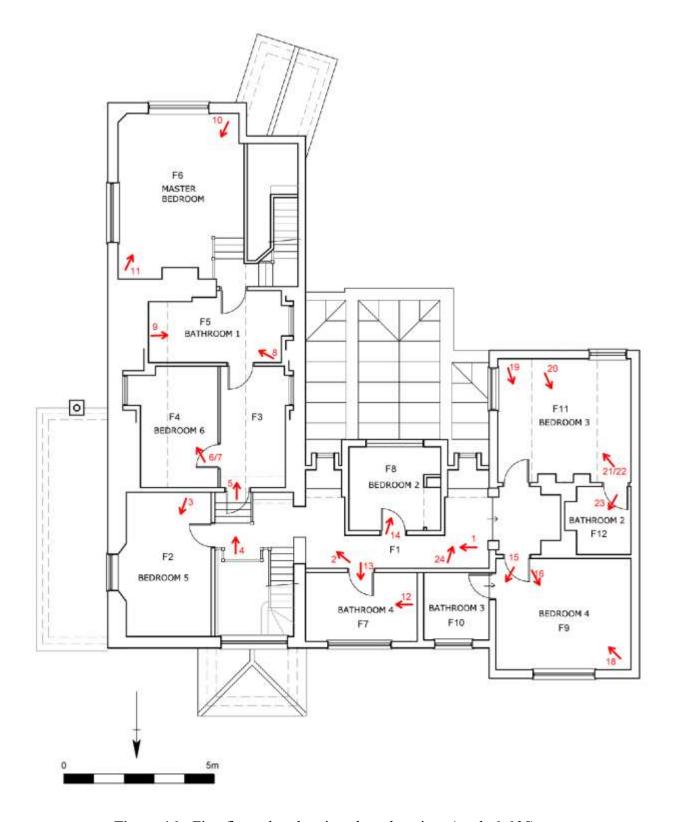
First floor plan showing photo locations (*scale 1:125*)
